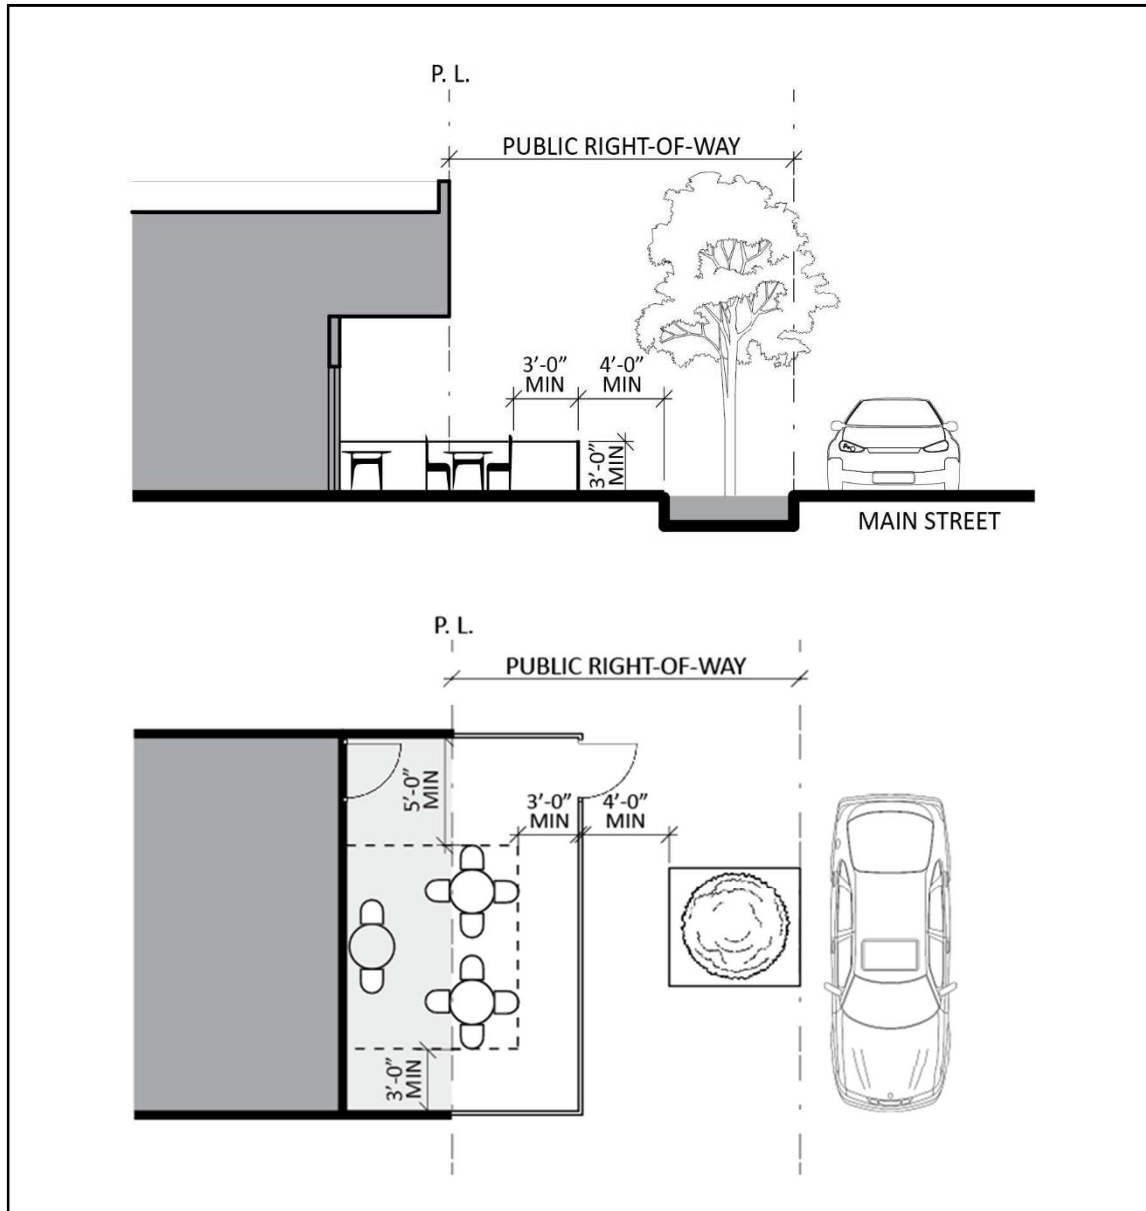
Example of a dining alcove in conjunction with an outdoor dining area in the public right-of-way with a barrier.
